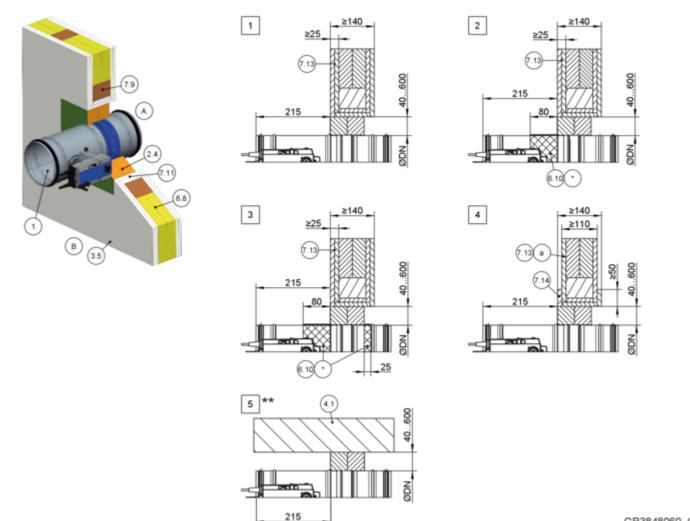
Dry mortarless installation into a lightweight partition wall, with fire batt, with half-timbered construction
